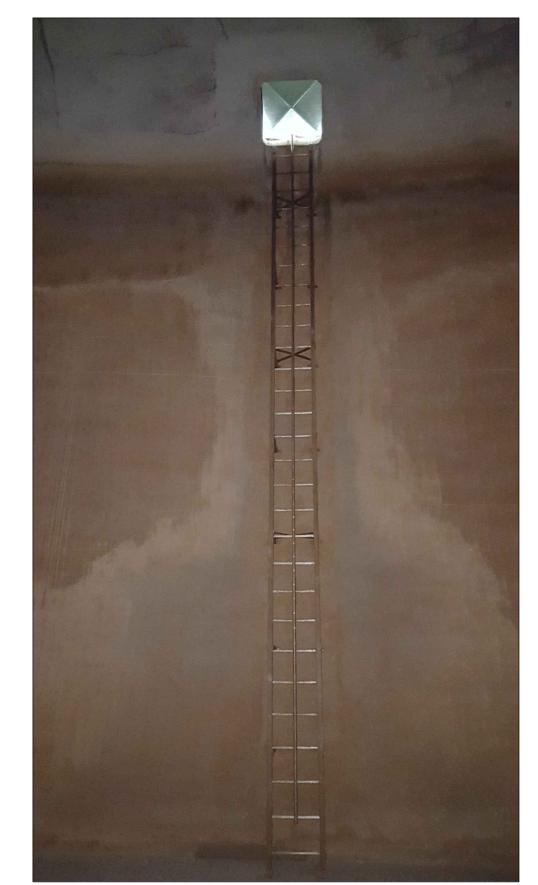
West MBPS GST Interior Access Ladder Issues were not seen on the existing access ladder.
